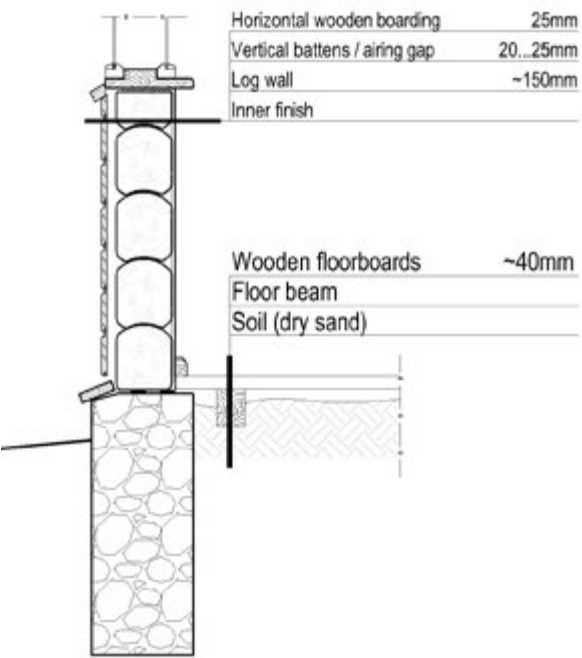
Traditional foundation and floor solution. Drawned by Üllar Alev. © The author
